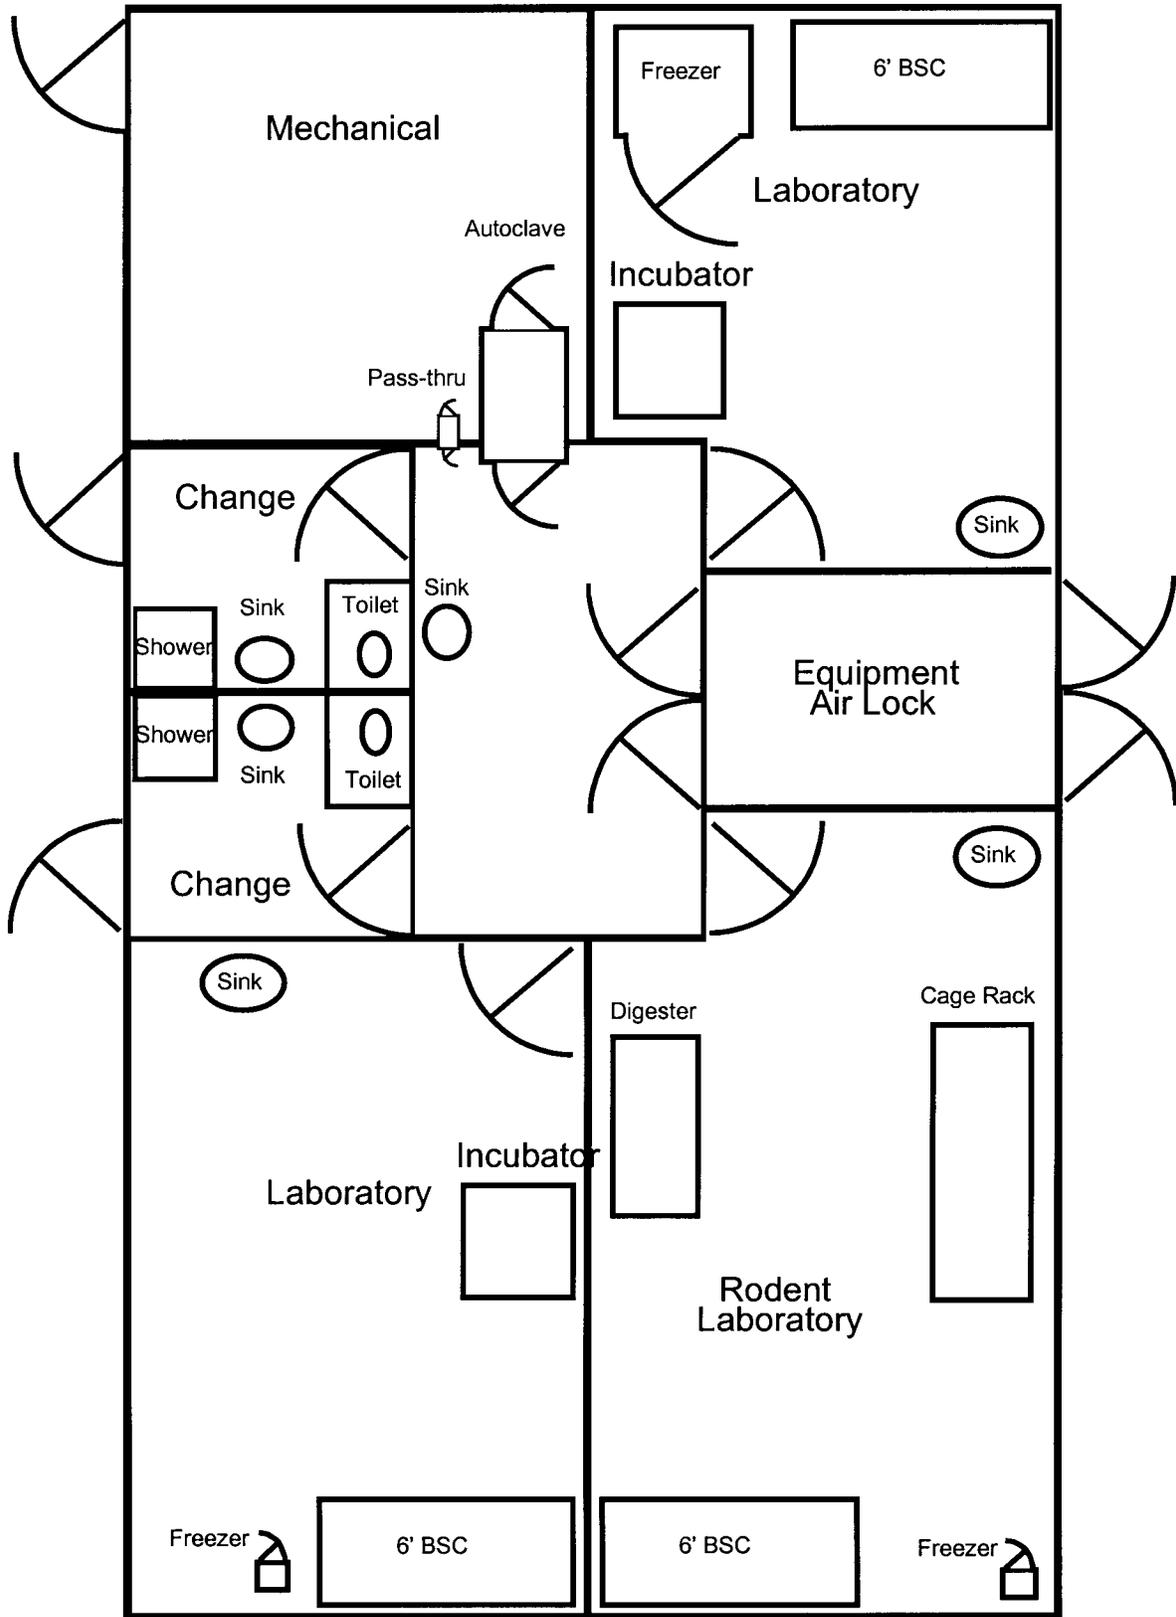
Conceptual floor plan for the proposed BSL-3 facility at LLNL (not to scale)
